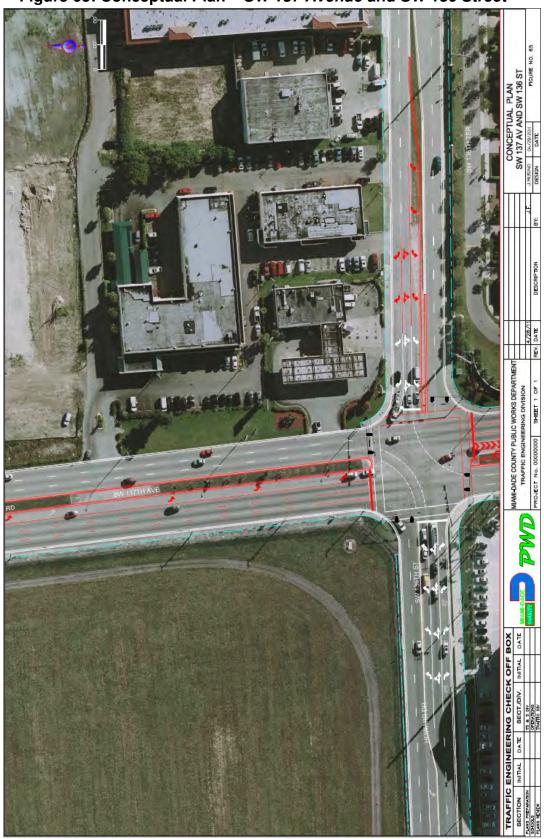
Conceptual Plan – SW 137 Avenue and SW 136 Street
